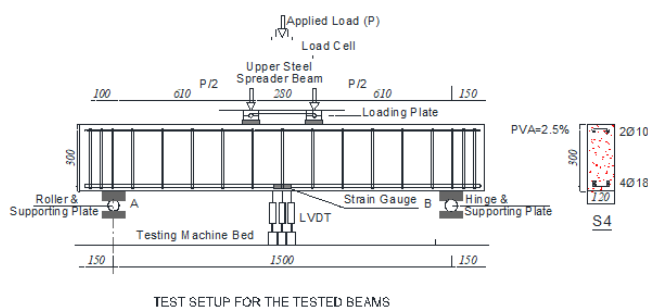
Beams Geometrical and Steel Reinforcement Details [3]
